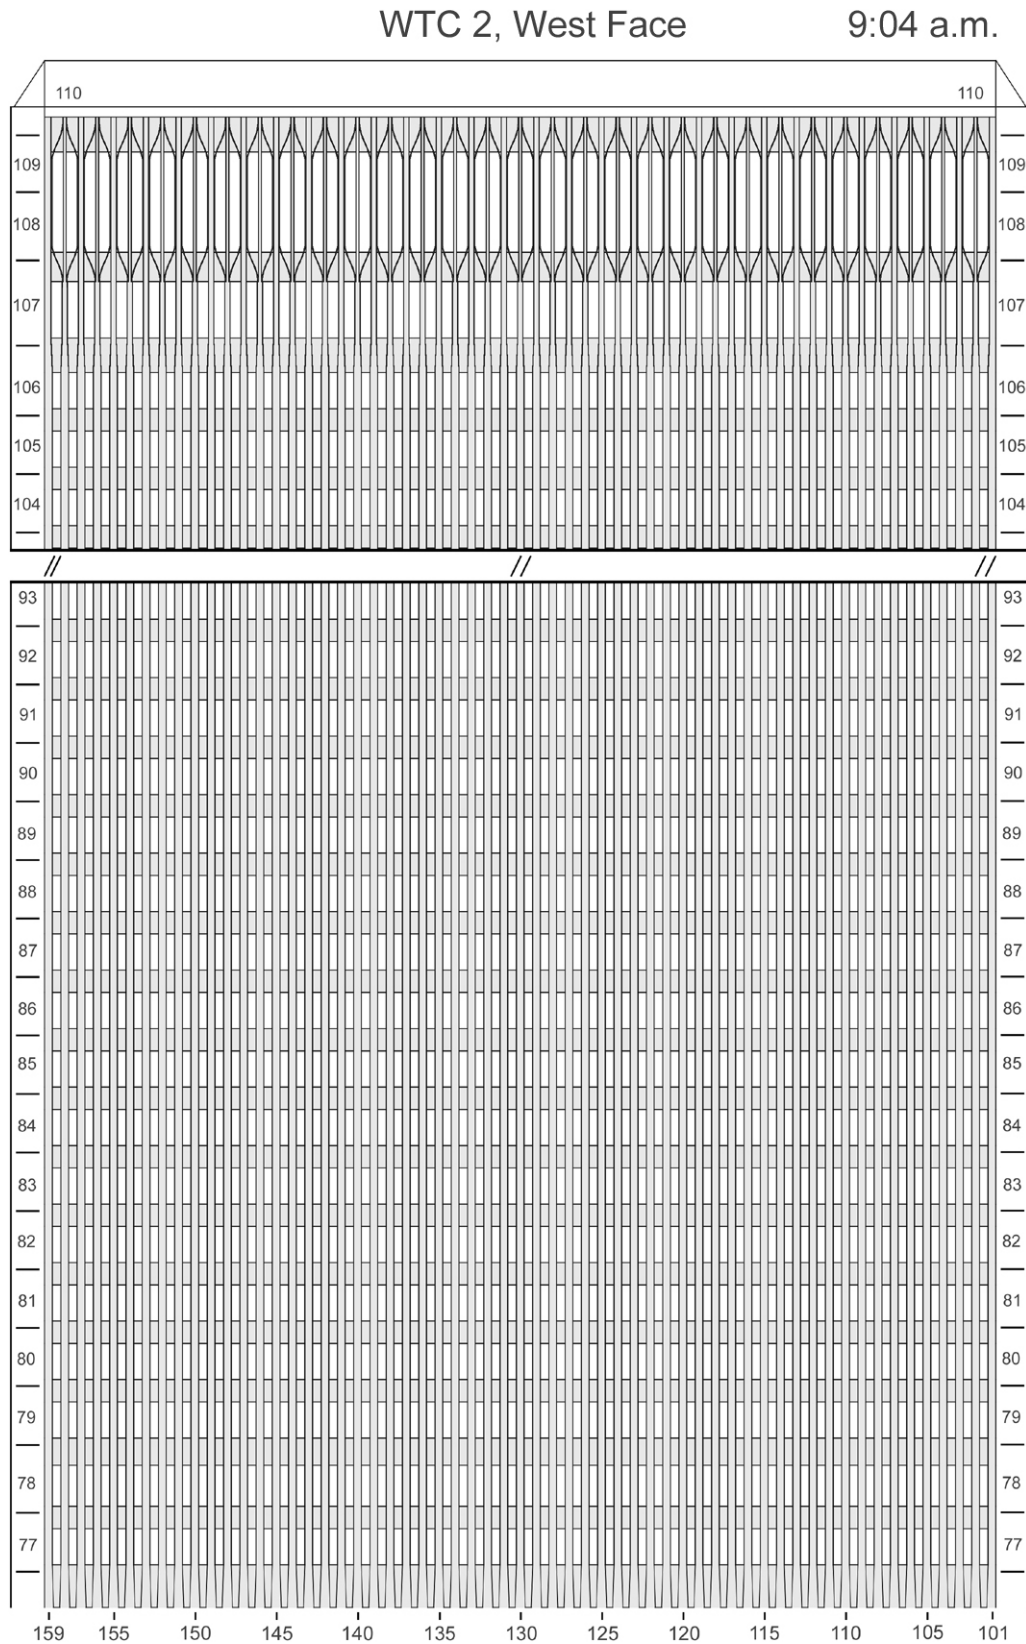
Diagram of the west face of WTC 2 for floors 77 to 93 and floors 104 to 110 at 9:04 a.m. showing windows where smoke was observed and those hidden from view.
